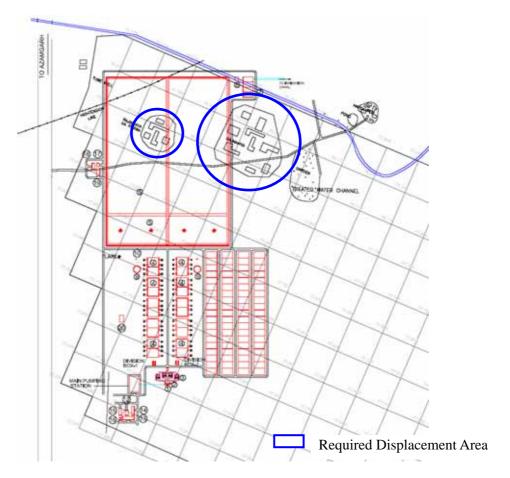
Proposed Layout of Sathwa Sewage Treatment Plant
